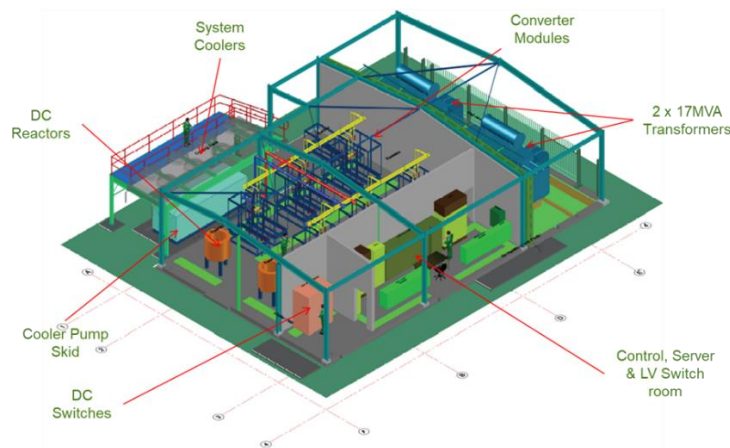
Detailed 3D General Arrangement of the MVDC stations with all plant installed.
